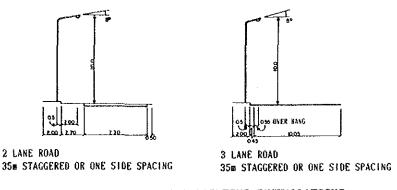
TYPICAL LIGHTING INSTALLATIONS
